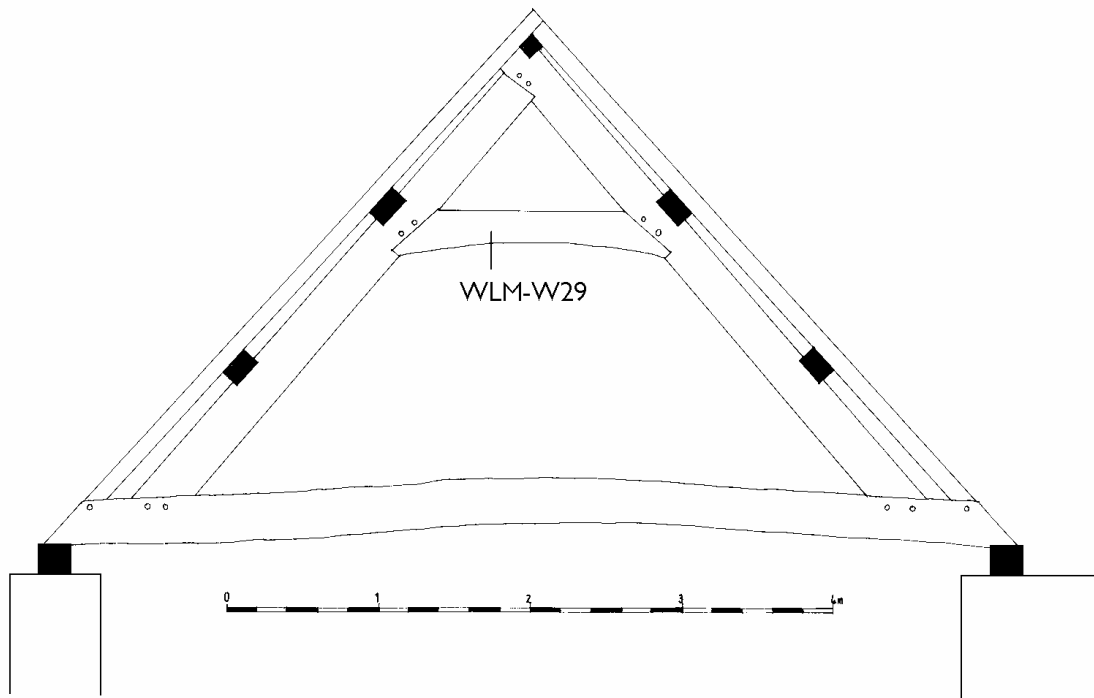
North range, truss 1 (east face), showing the location of sample WLM-W29
